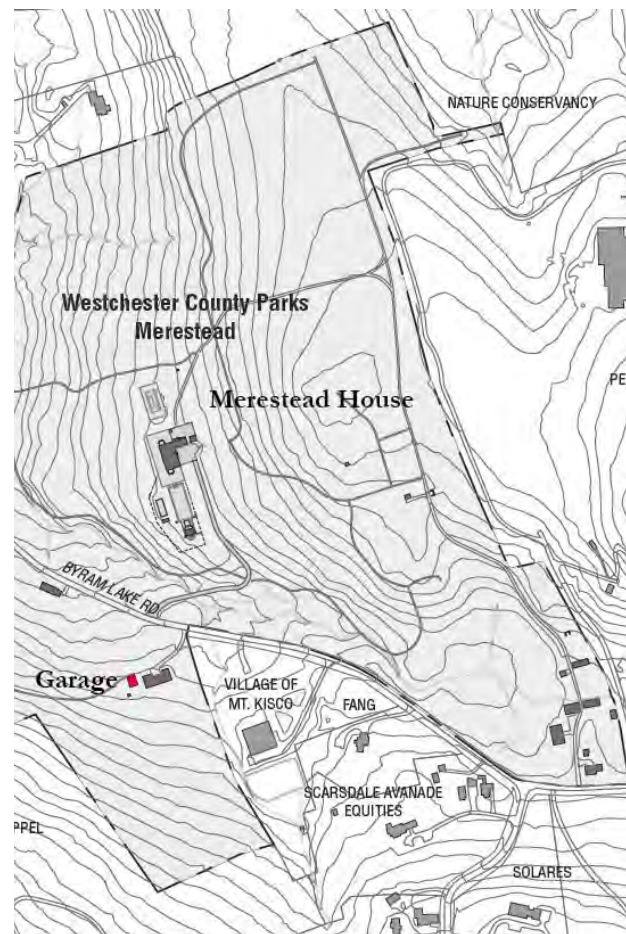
Site plan showing the location of the garage. (AKRF, INC/HA, 2015)
